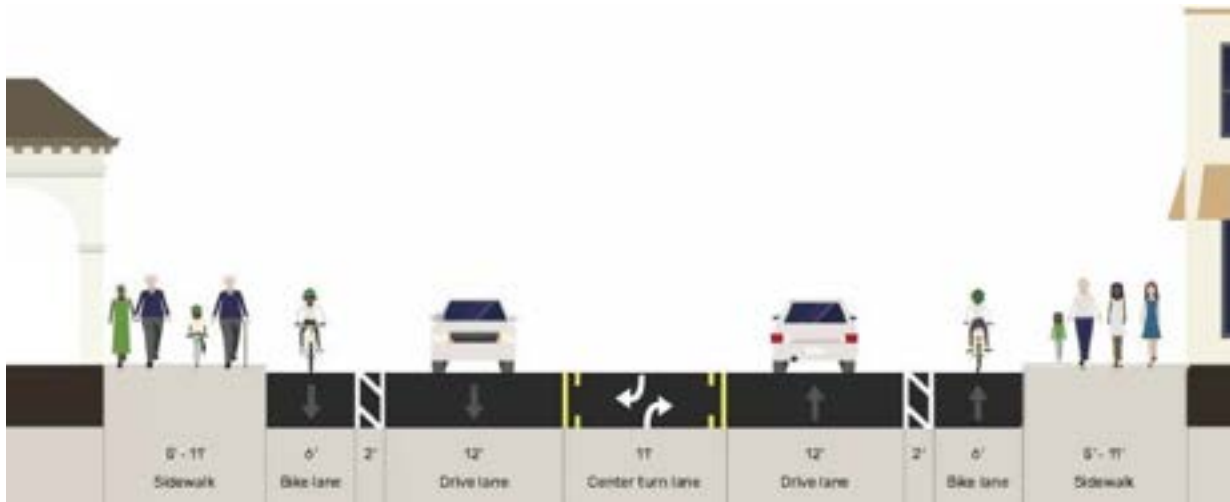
NE 3rd Street: Buffered Bike Lanes and Sidewalk Infill Concept
